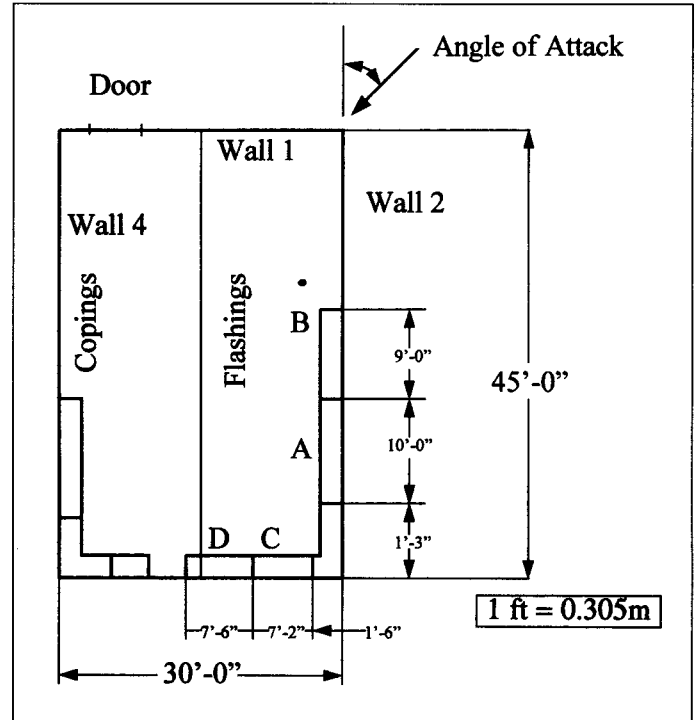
Plan view on metal edge flashing and coping installations on WERFL test building.
